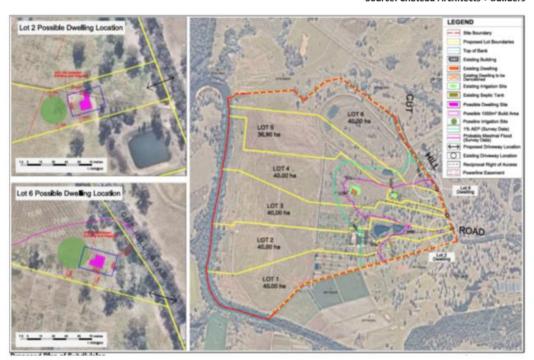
The Approved Plan of Subdivision Source: Camden Council DA Tracker
